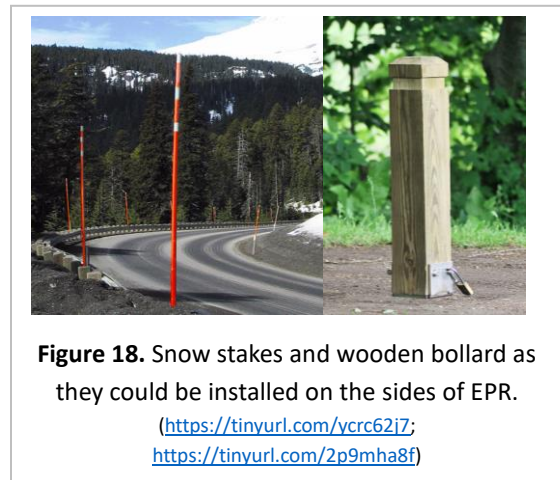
Snow stakes and wooden bollard as they could be installed on the sides of EPR.
